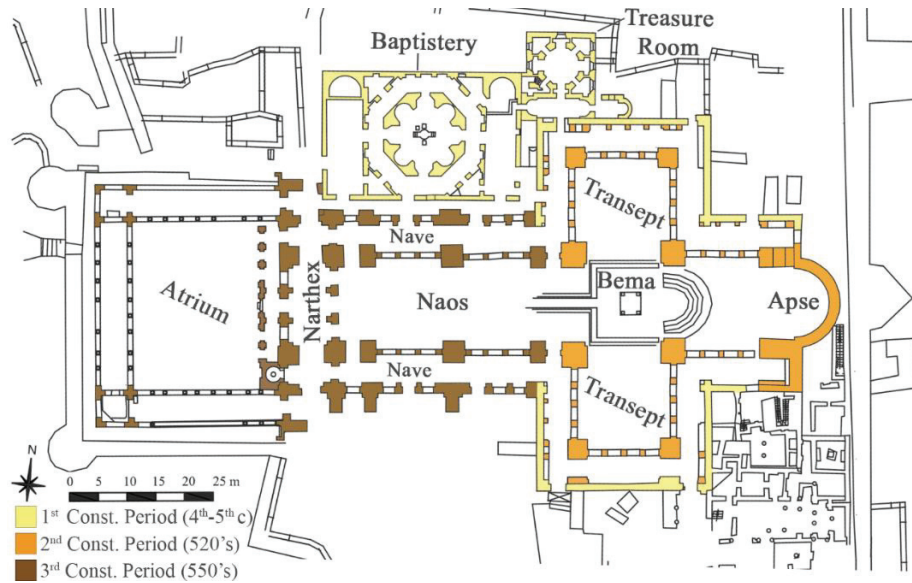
Plan of St. Jean Basilica showing the construction phases (Revised from drawing by Ayasuluk Hill and St. Jean Basilica Excavation Archive, 2020)
